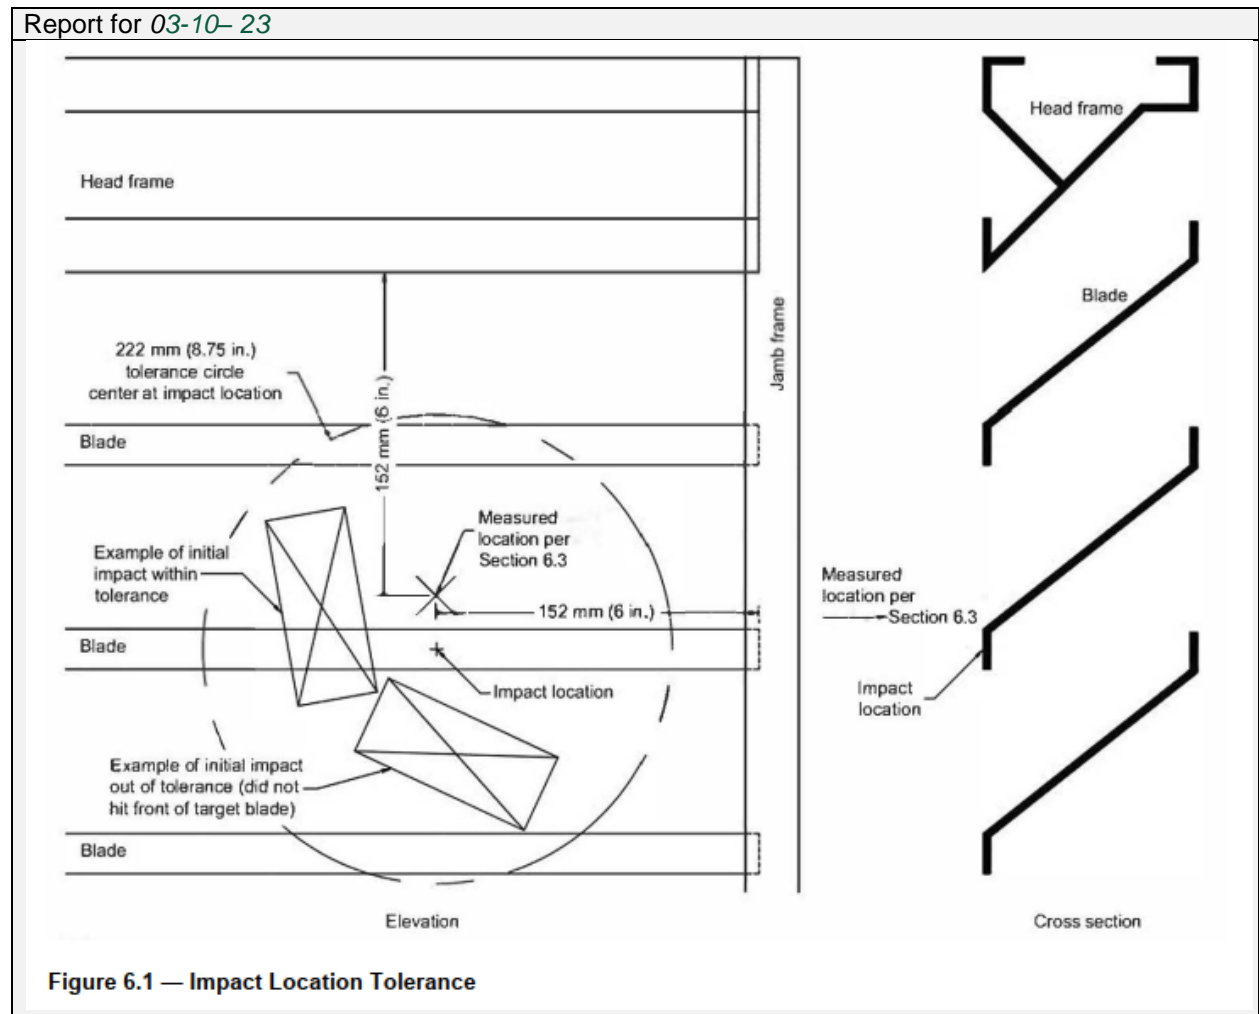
(3) LOUVER IMPACT TOLERANCE
